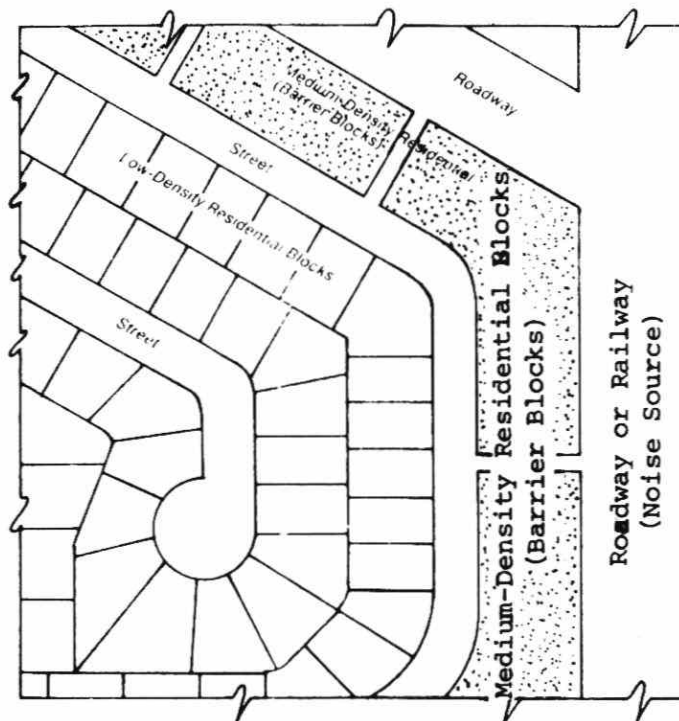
B.15(b): Typical Mixed Residential Blocks as an Intervening Structure
